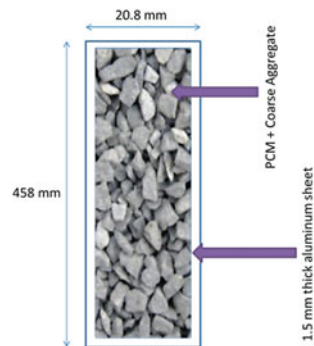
PCM and coarse aggregate filled in aluminum box cladding (photo top view)
